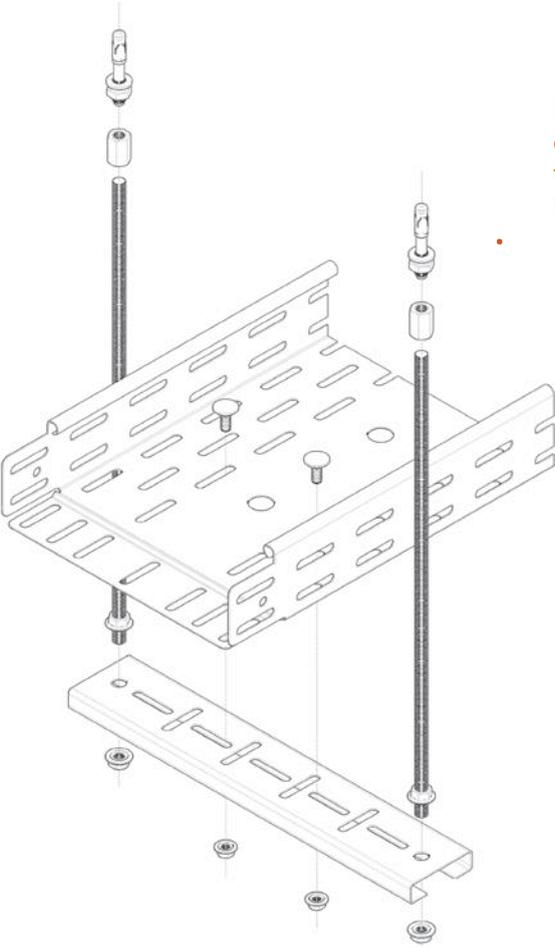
Example of the installation of the cable tray onto the ceiling with threaded rod and the NKP-PL profile or NKP-VN hangingbracket
